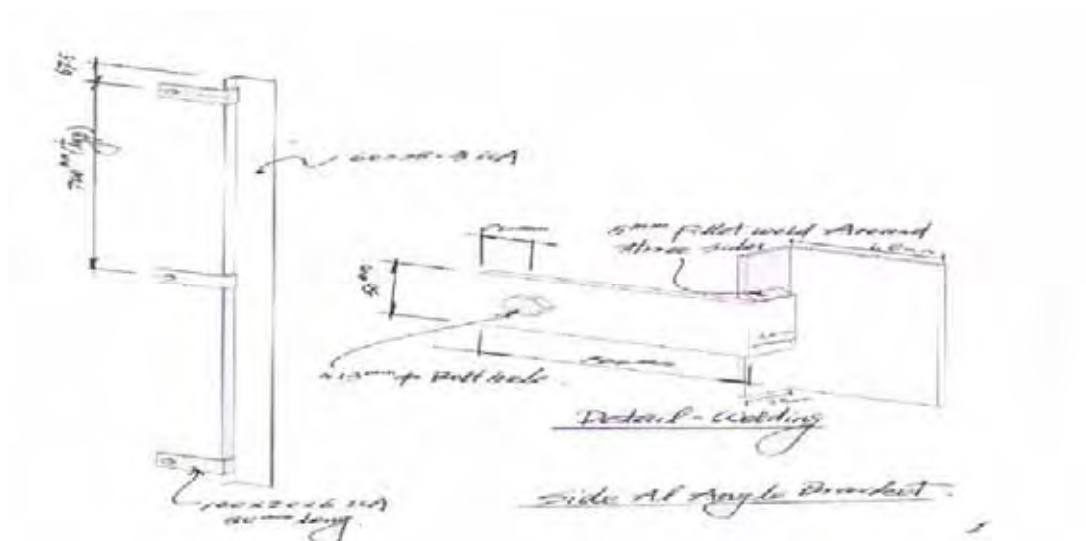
Typical angle bracket construction secured to louvre and chemically anchored to building concrete.
